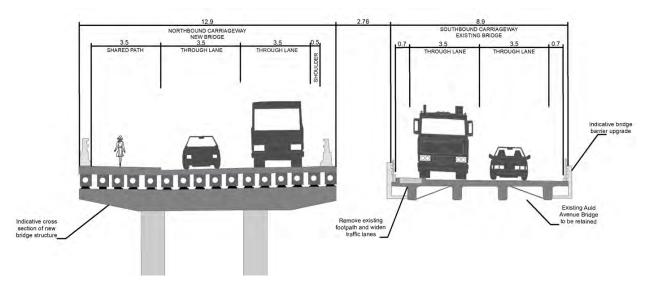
Plank bridge section concept (Source: Aurecon, Transport)
